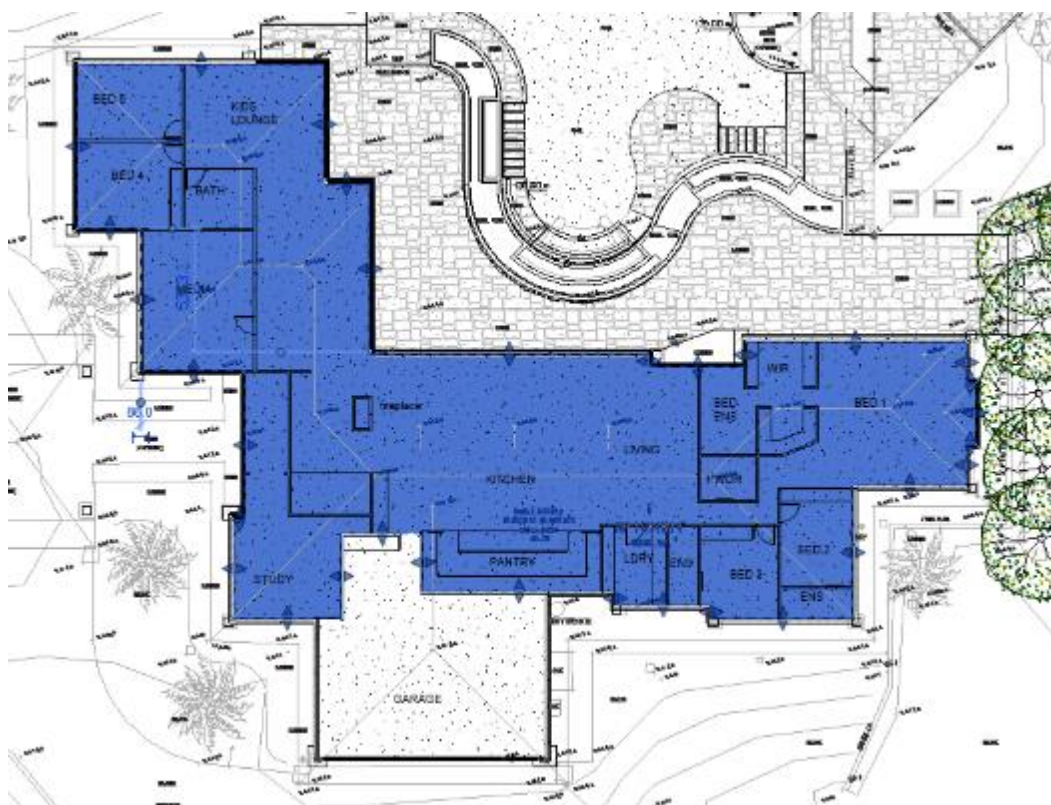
floor plan and gross floor area calculation of the existing principal dwelling (451.7m²)
